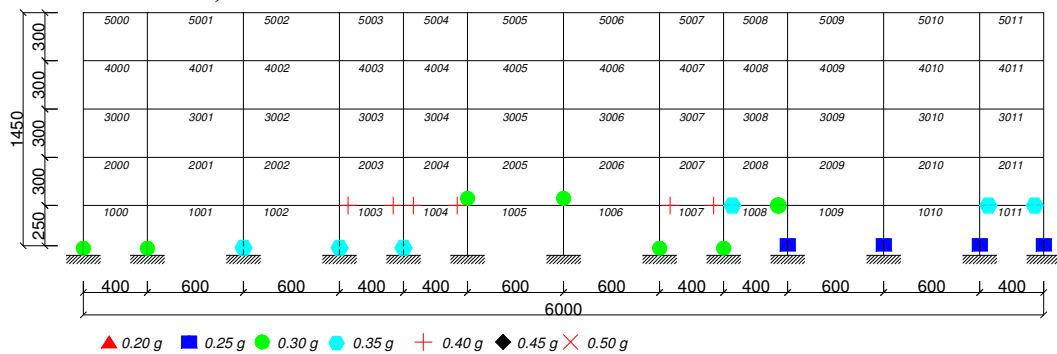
Structural behaviour of residential building in LDC for Erzincan earthquake: brittle mechanisms.
